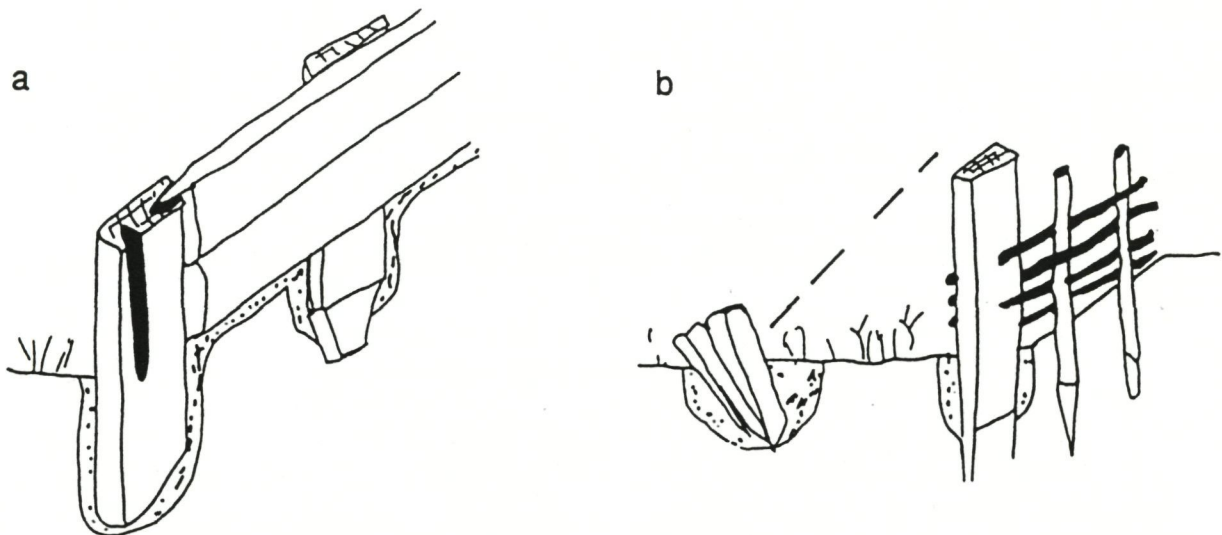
a) bulwark wall construction, b) post and wattle walls, often buttressed
